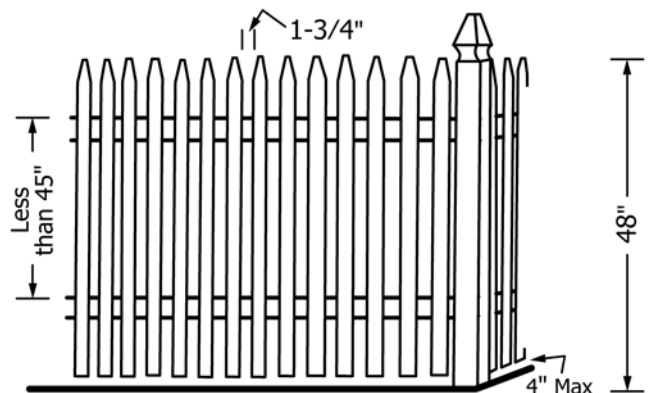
If Horizontal Members are Less Than 45 in. Apart, Vertical Spacing Shall Not Exceed 1¾ in.
